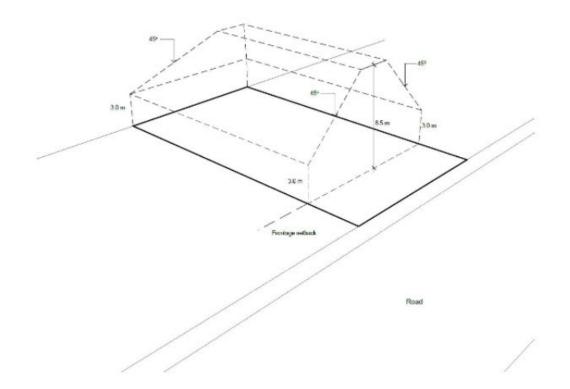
Building envelope for corner lots as required by clause F5.4.2 A3(a) and clause F5.5.1 A2(a)
